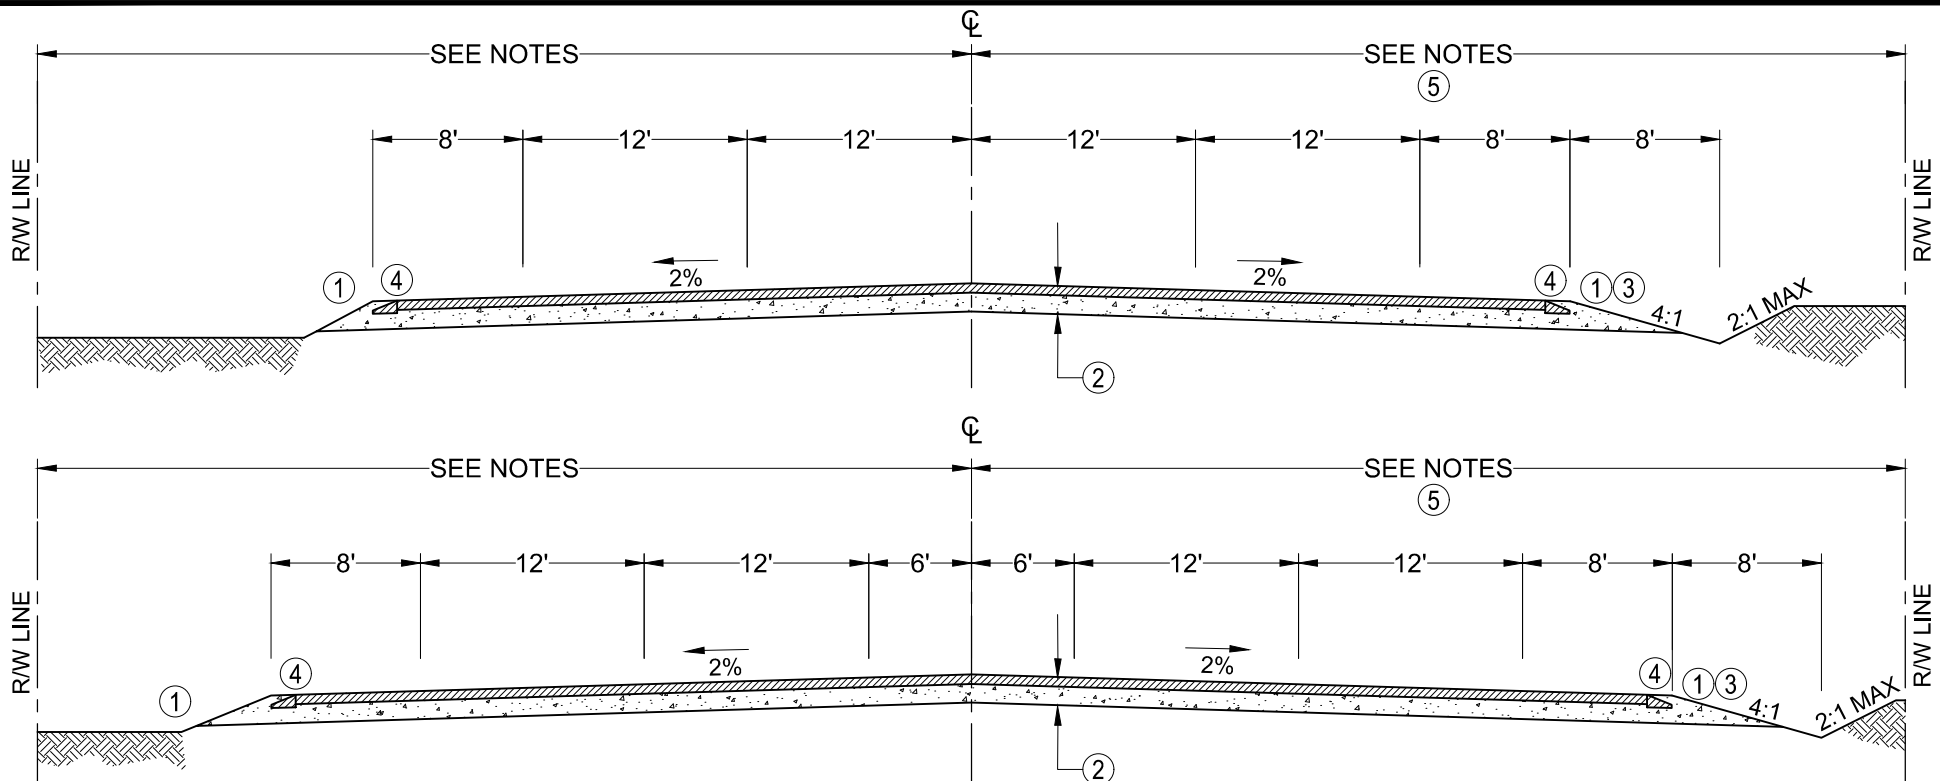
LOCAL STREET WITHOUT CURB & GUTTER TYPICAL STREET SECTION
